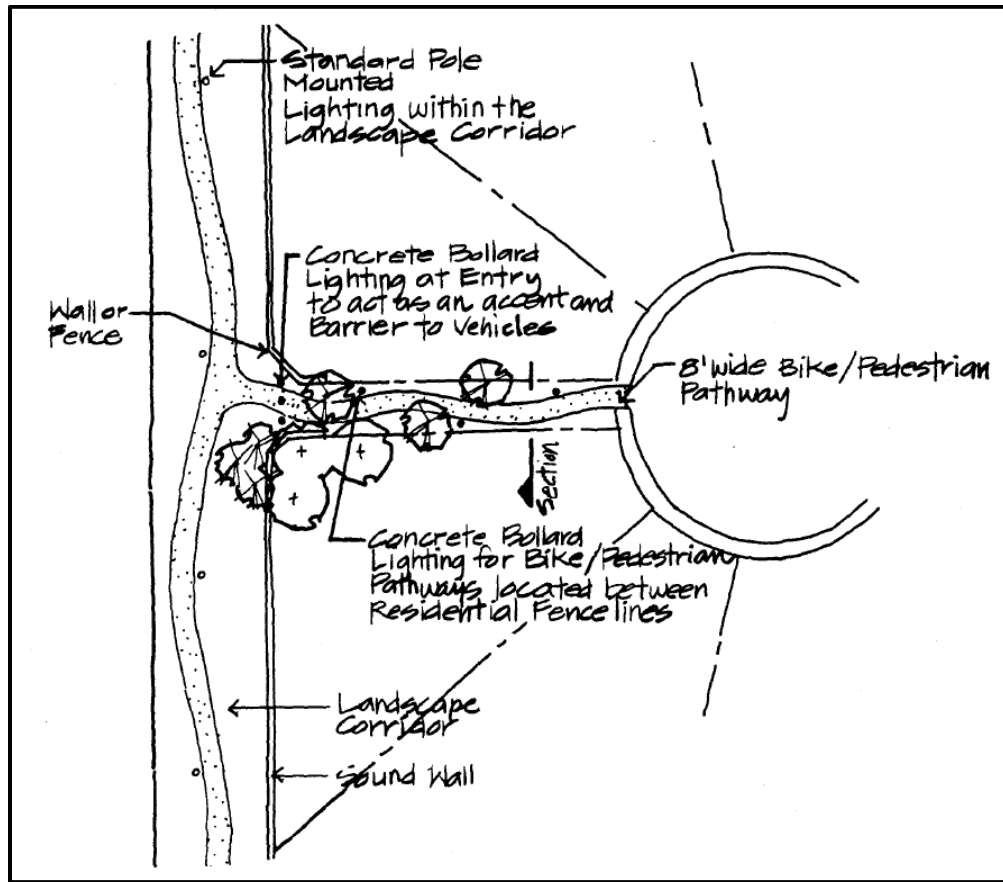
PLAN VIEW - Pathway Lighting and Landscape Illustration
